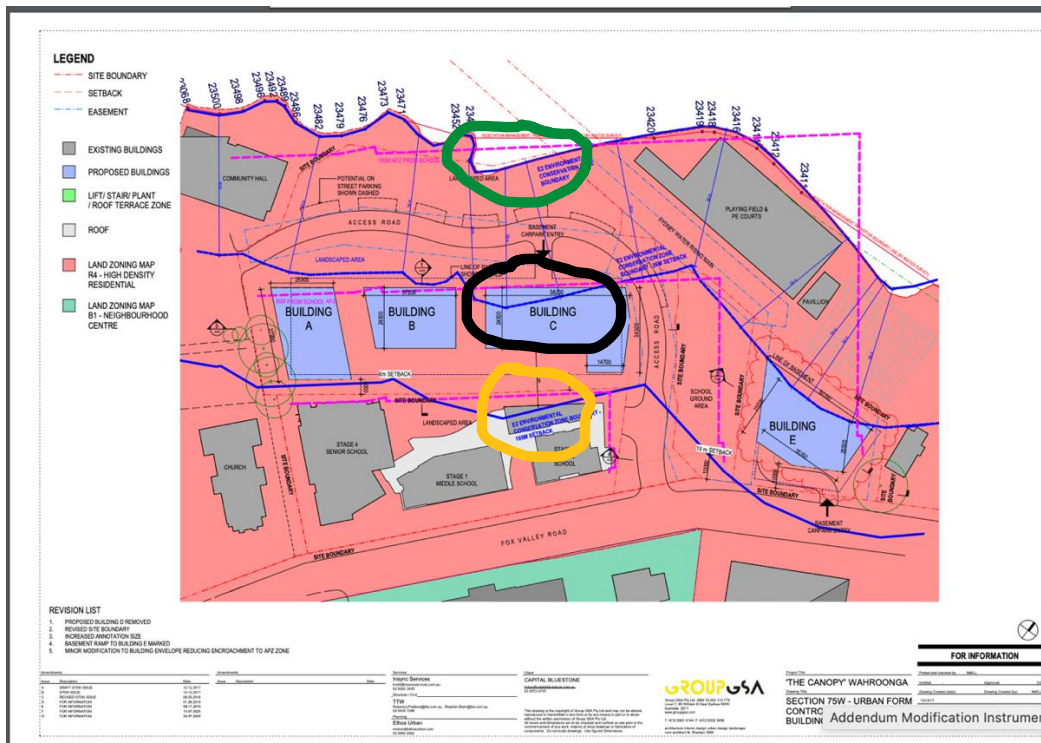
| Revised Scheme (source: Group GSA Architects plan submitted with revised request)
